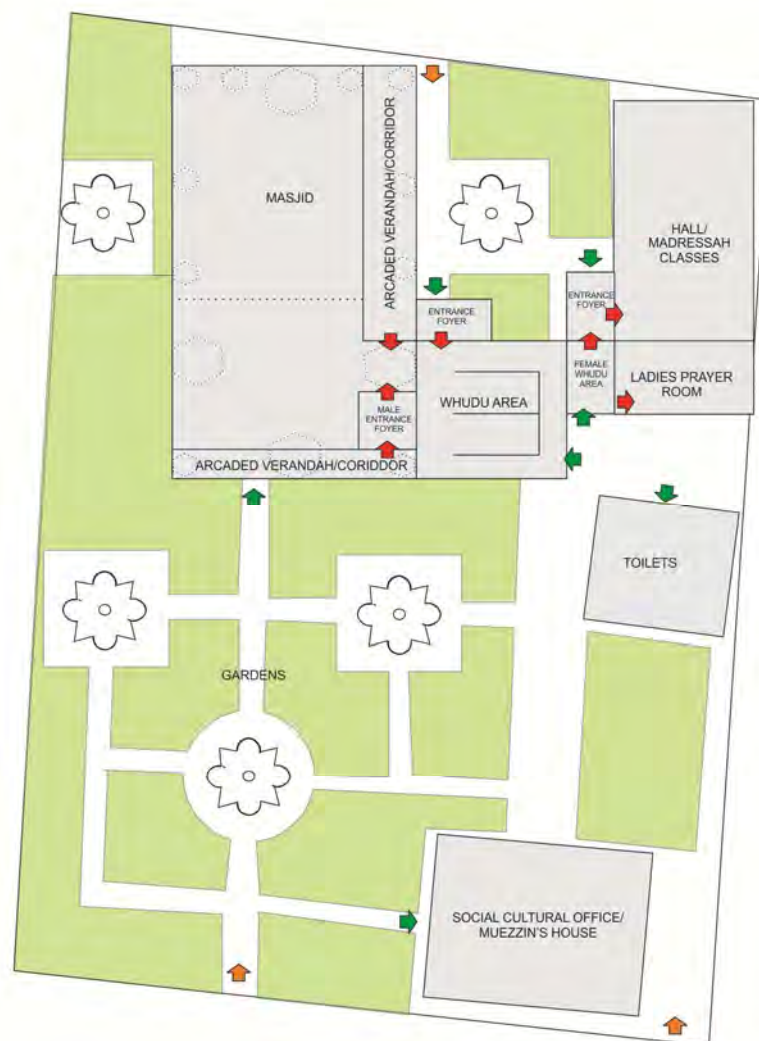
, Layout plan of the building showing different spaces and various entrances (Author, 2011)
